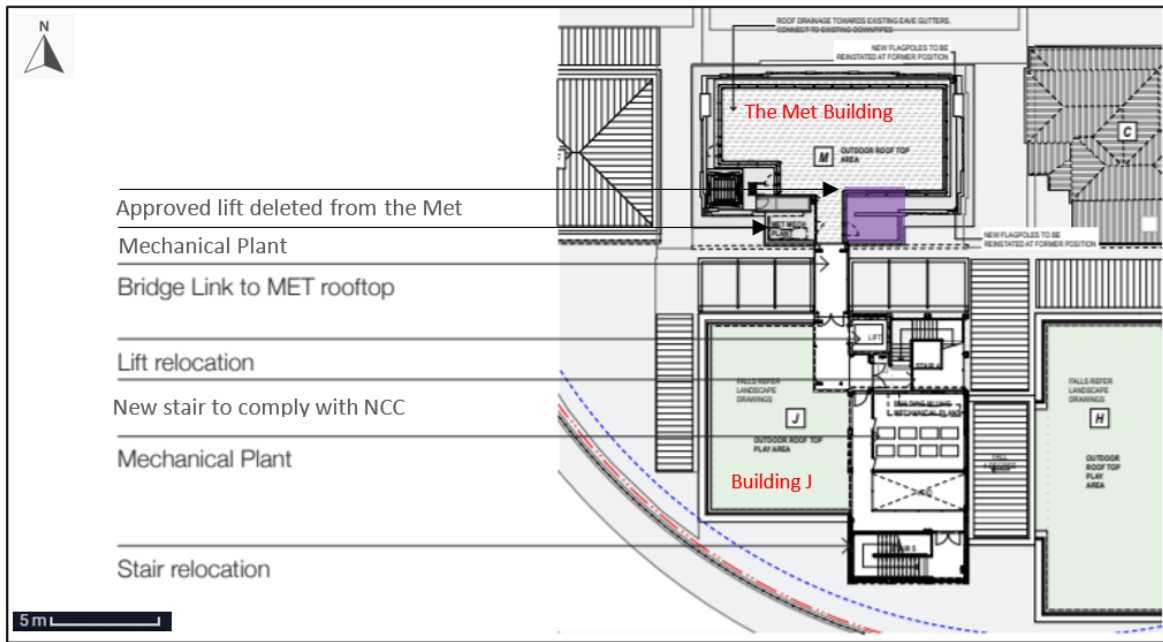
| Originally proposed modifications to the rooftop of the Met and Building J (Base Source: Modification Report 2021)
